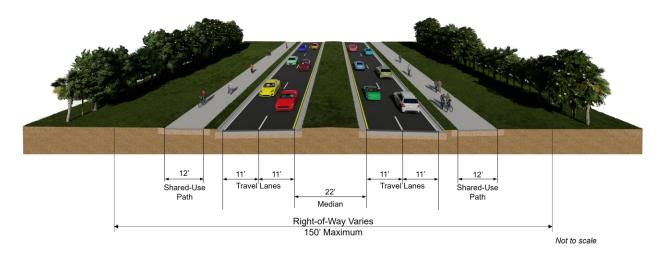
Preliminary Typical Section for Four-Lane Roadway
